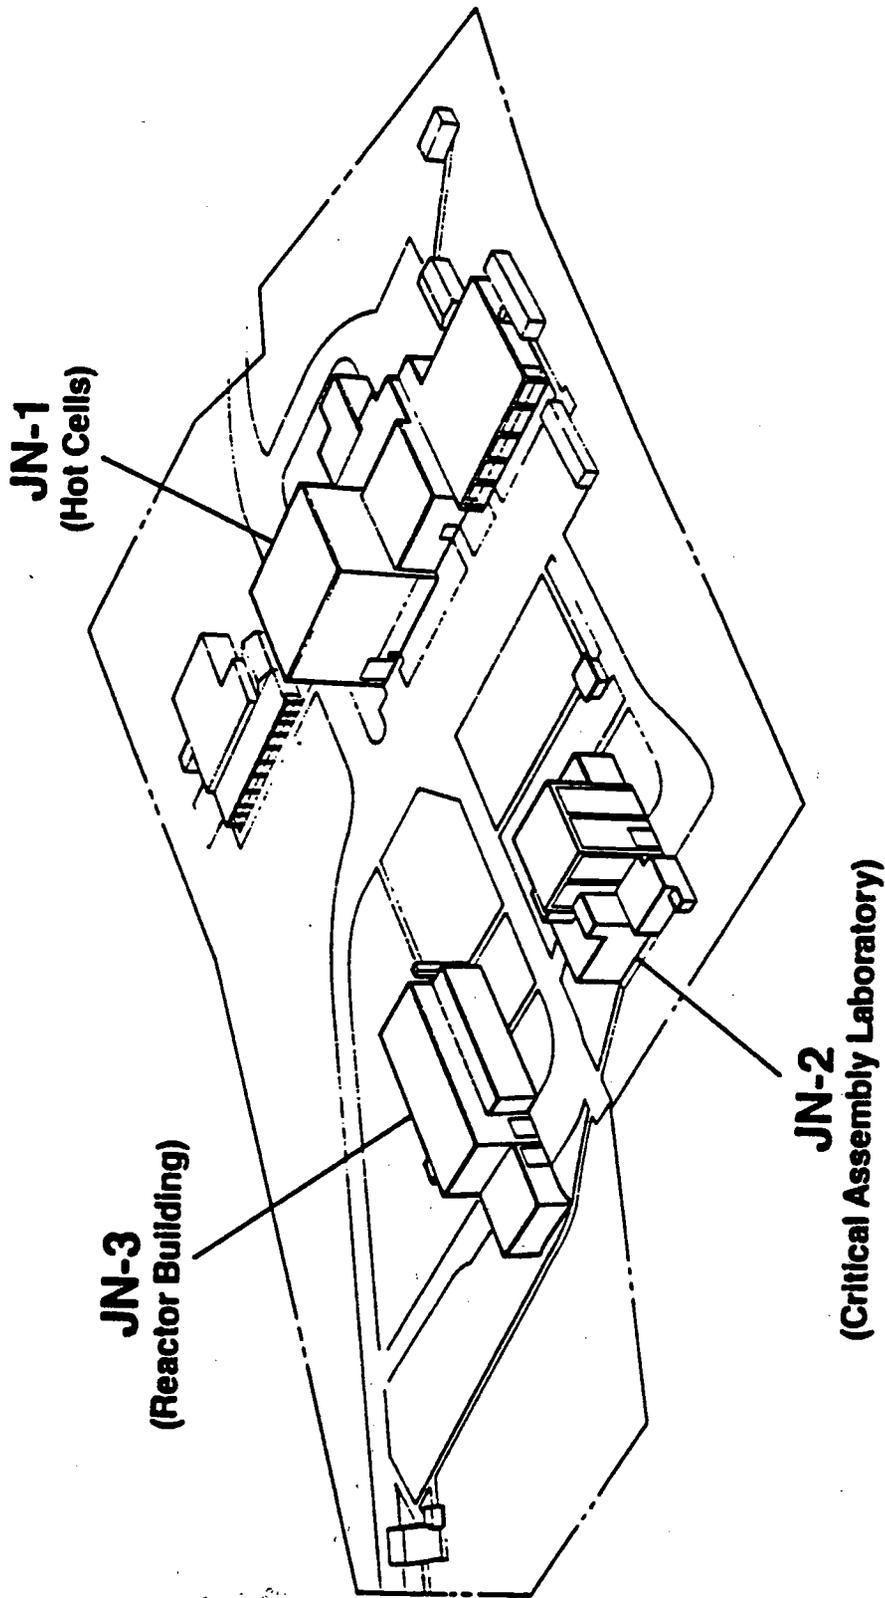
Building Numbers and Locations at the West Jefferson Site
